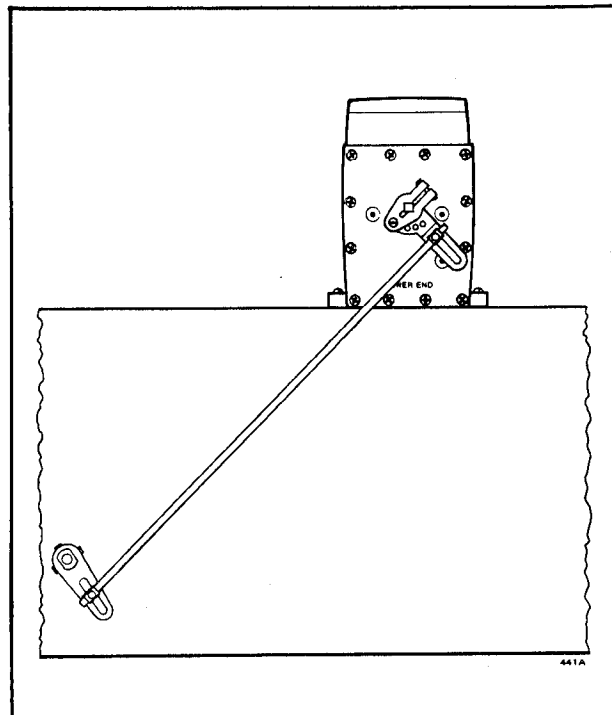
MODUTROL MOTOR MOUNTED DIRECTLY ON THE DUCT (WITHOUT A MOUNTING BRACKET) TO CONTROL ONE DAMPER.
